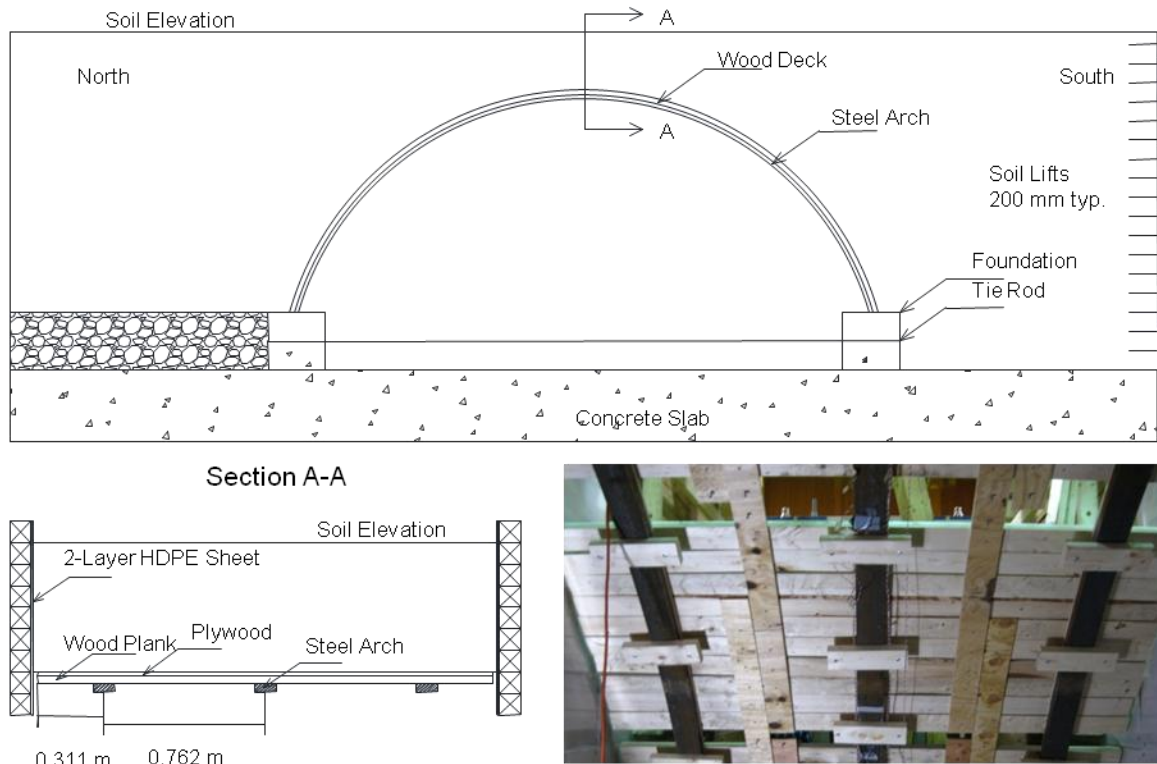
Elevation View of Arches w/Apex Cross Section and Photograph of Decking from Below Arches During Construction
